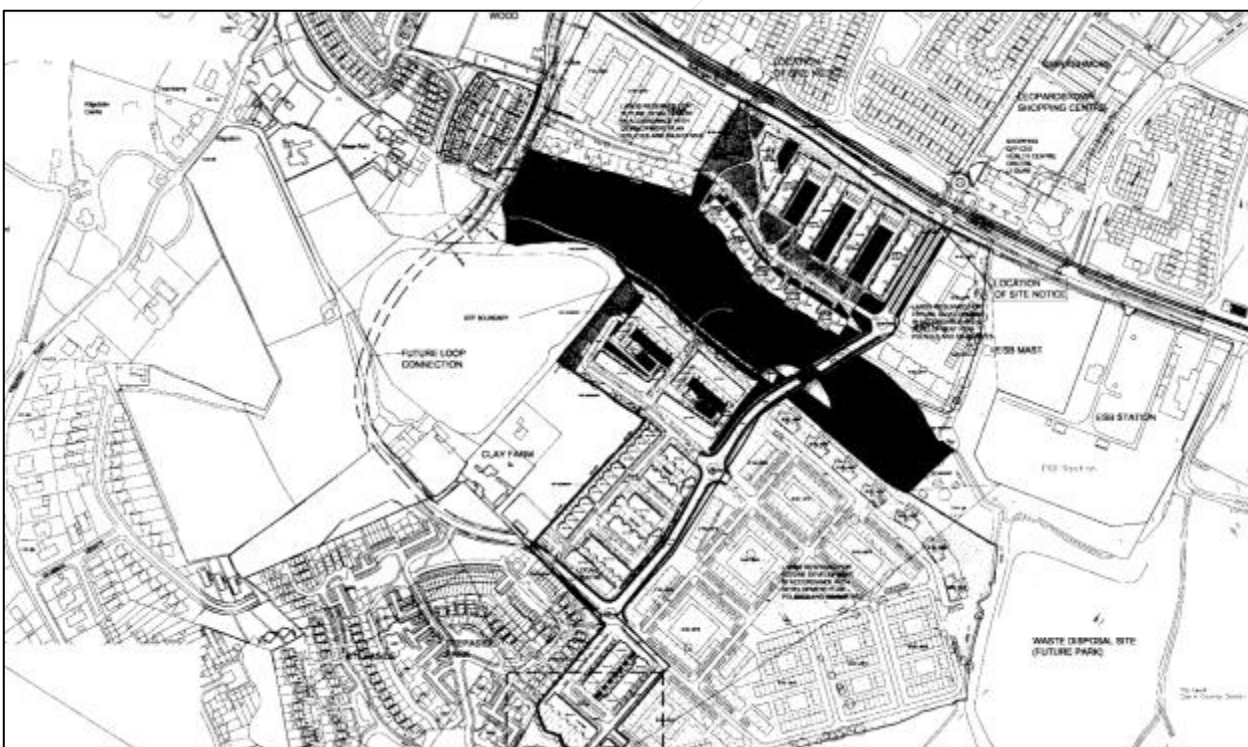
Site Layout Plan submitted at FI Stage to DLRCC
